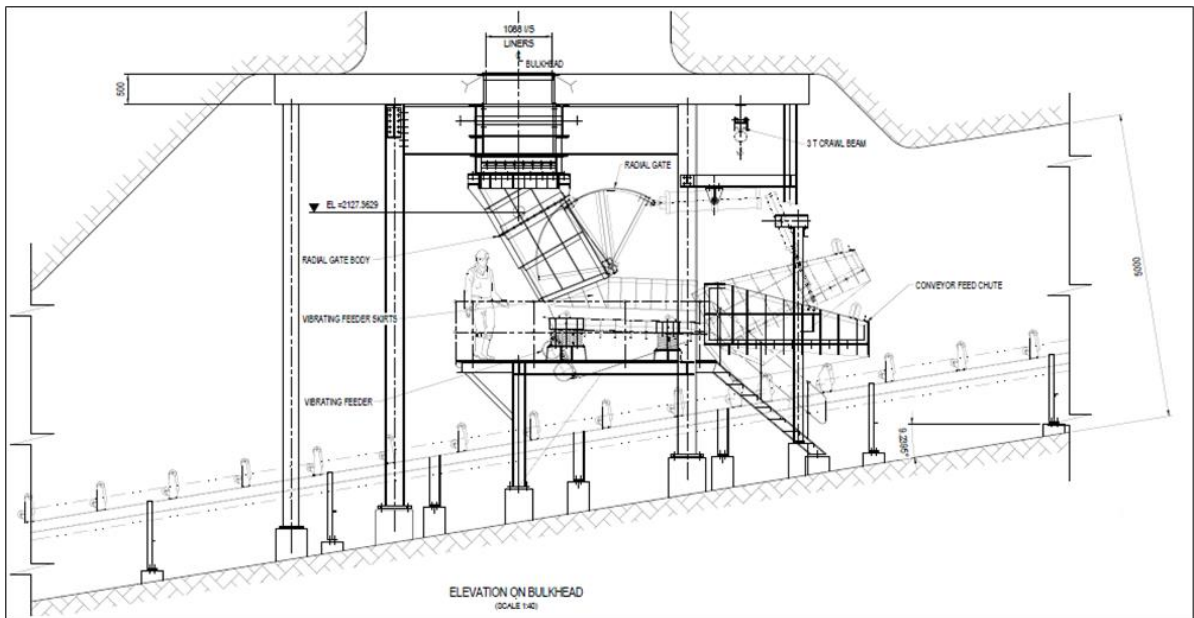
Proposed Layout of the Conveyor Loading Bulkhead, Elevation View
